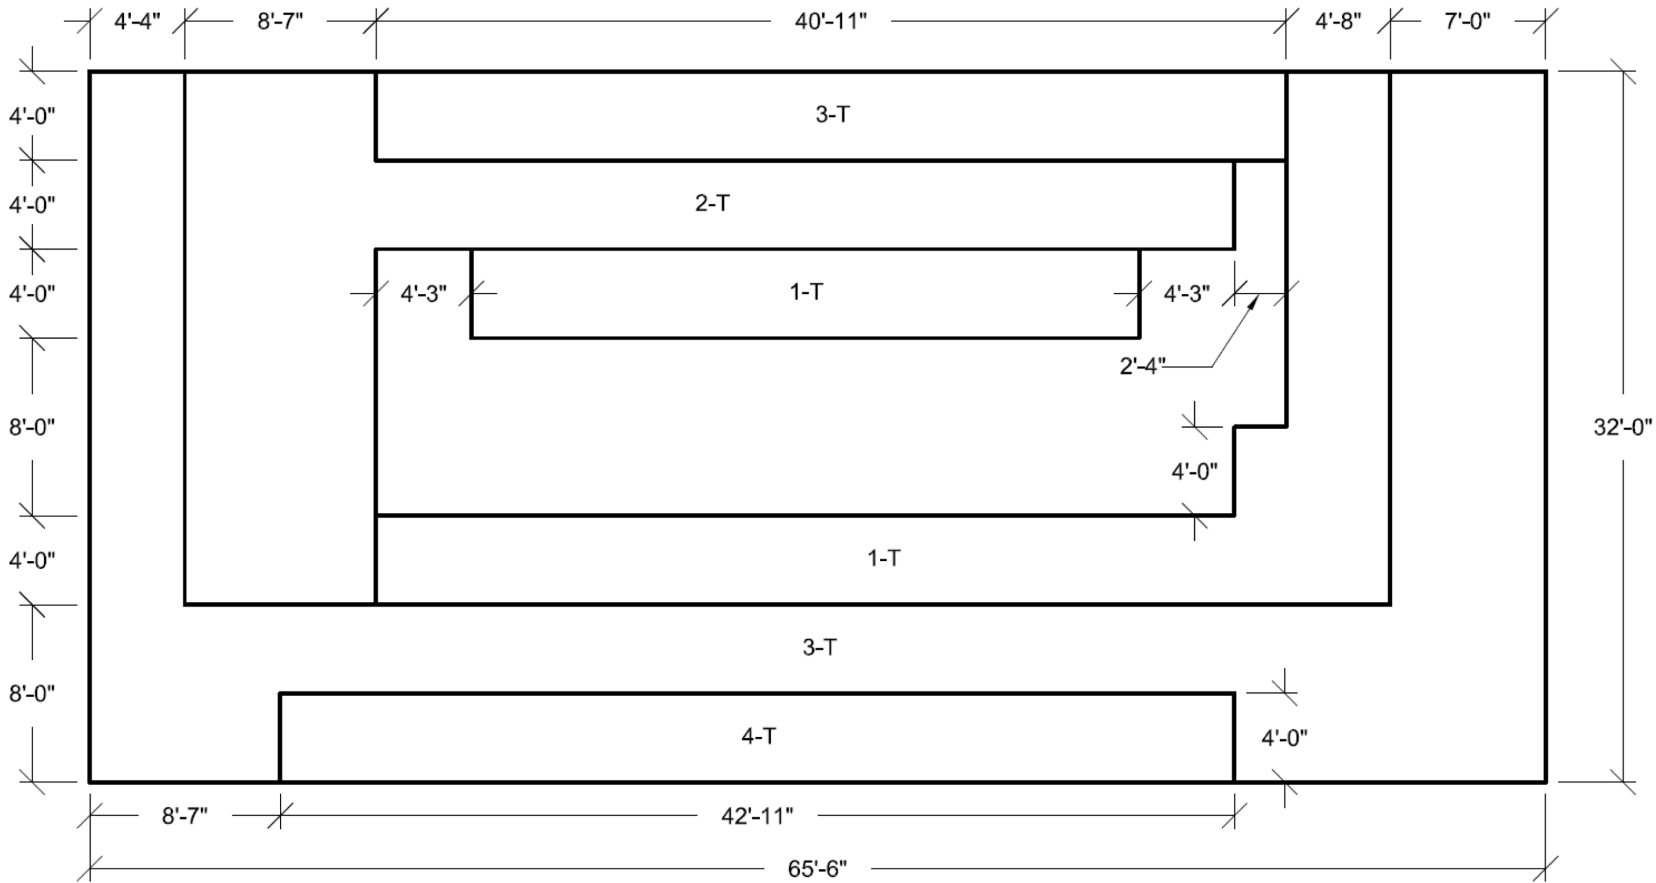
H.6-167 DGFSV Wall 7 Looking From Outside Transverse Reinforcement Zones
